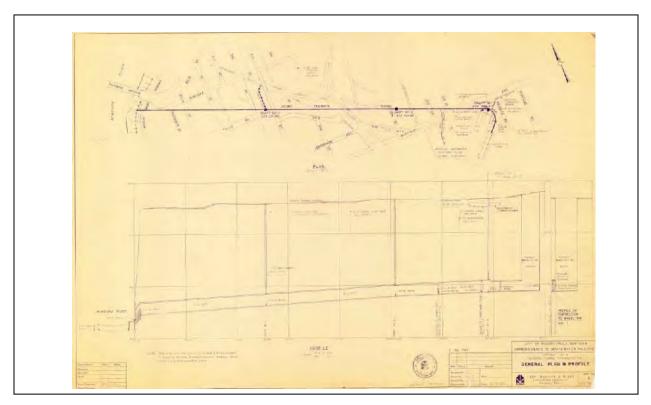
Tailrace Tunnel Rehabilitation – general plan showing location of tunnels. Provided by Applicant.
